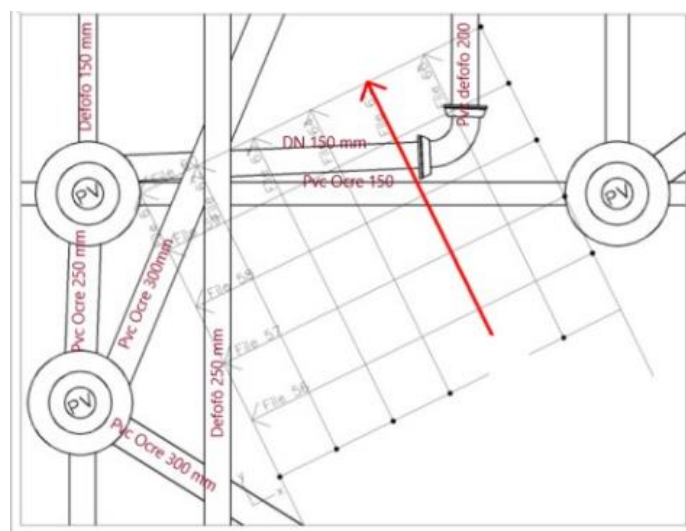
Overlay of mesh and plan. Source: Authors, 2021.
